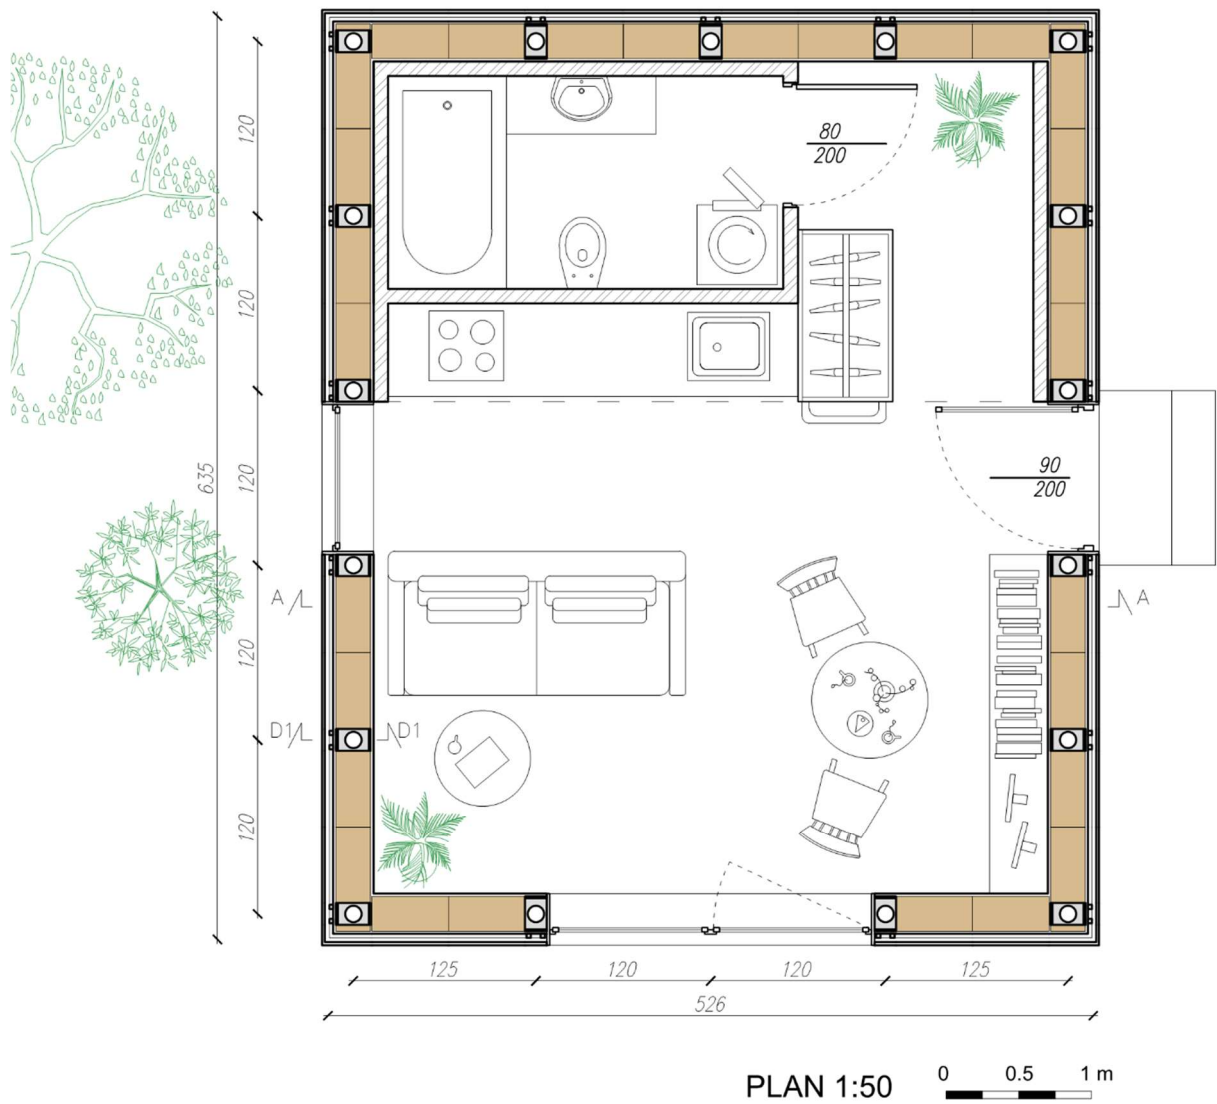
Ground floor plan view of the TFE Cardboard House.<sup>36</sup>
